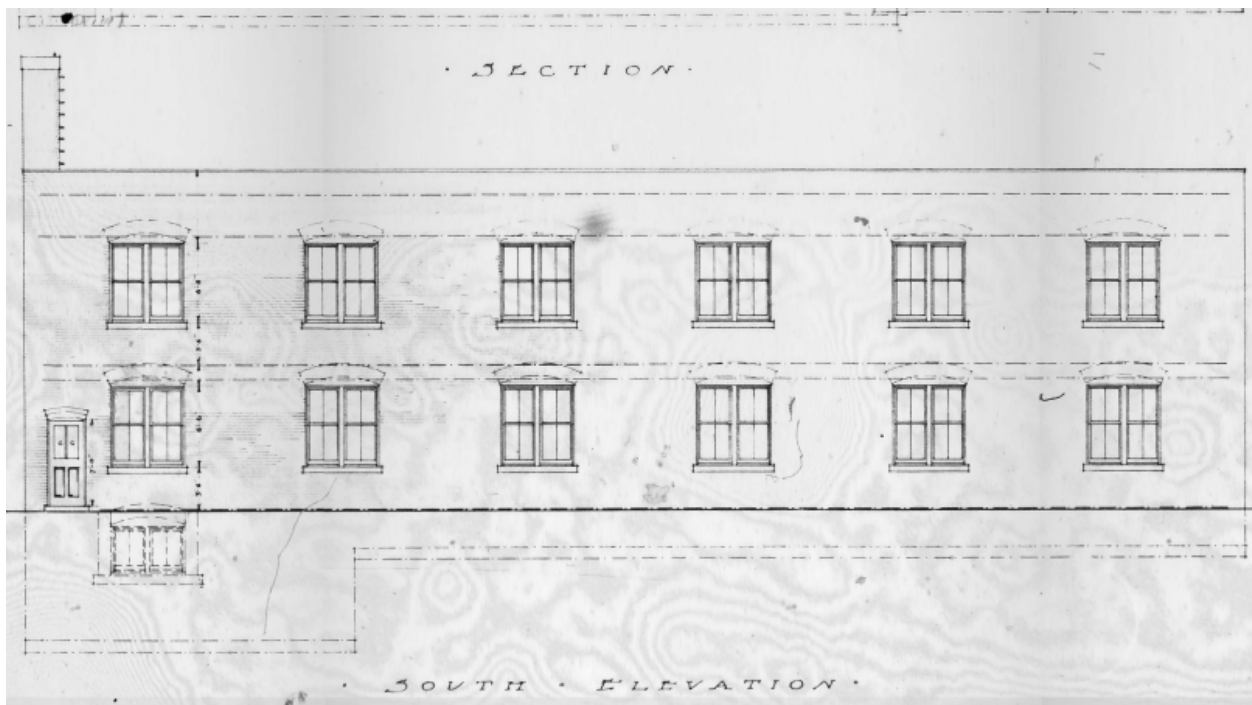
1924 rear (south) elevation drawing of 1497 Queen Street West by James M. Cowan showing original two-storey structure (Building Records).
